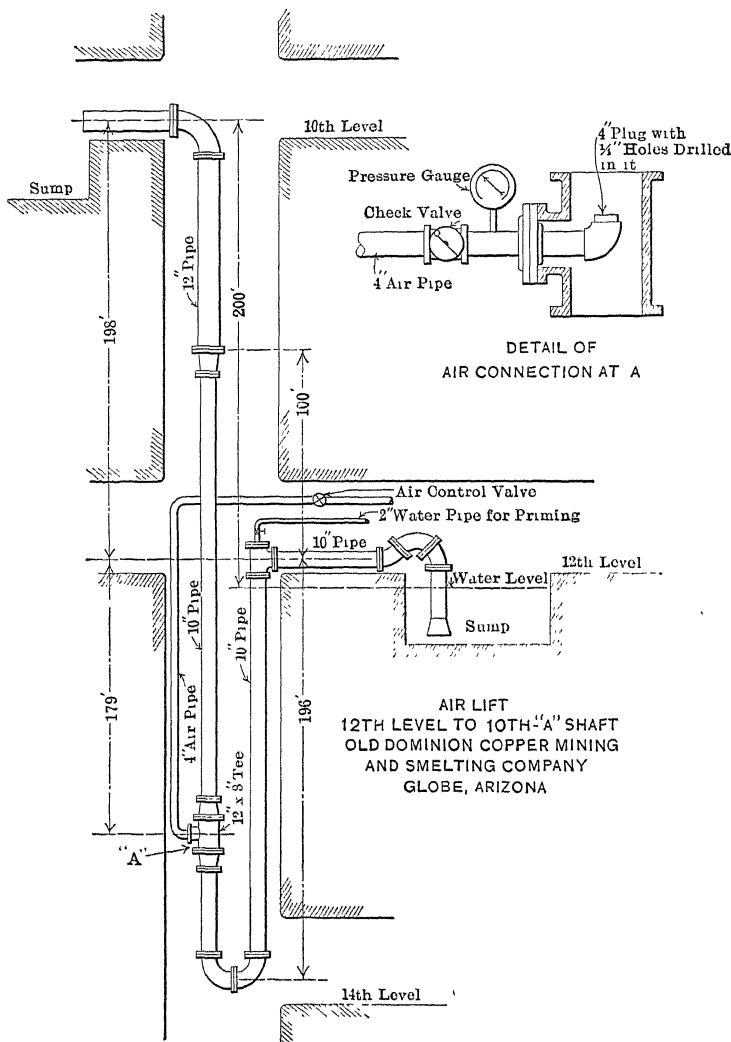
ARRANGEMENT OF PIPING ON 200-FT. AIR LIFT.
